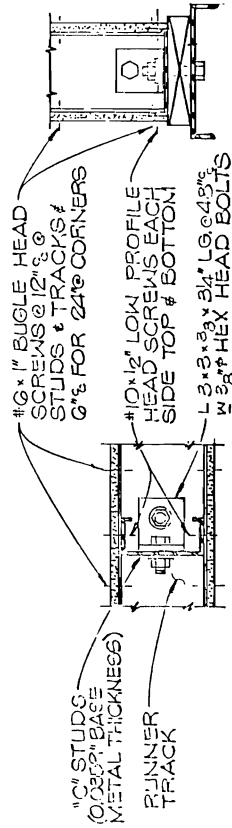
Test Assembly Plan & Details - Wall Type "C"
